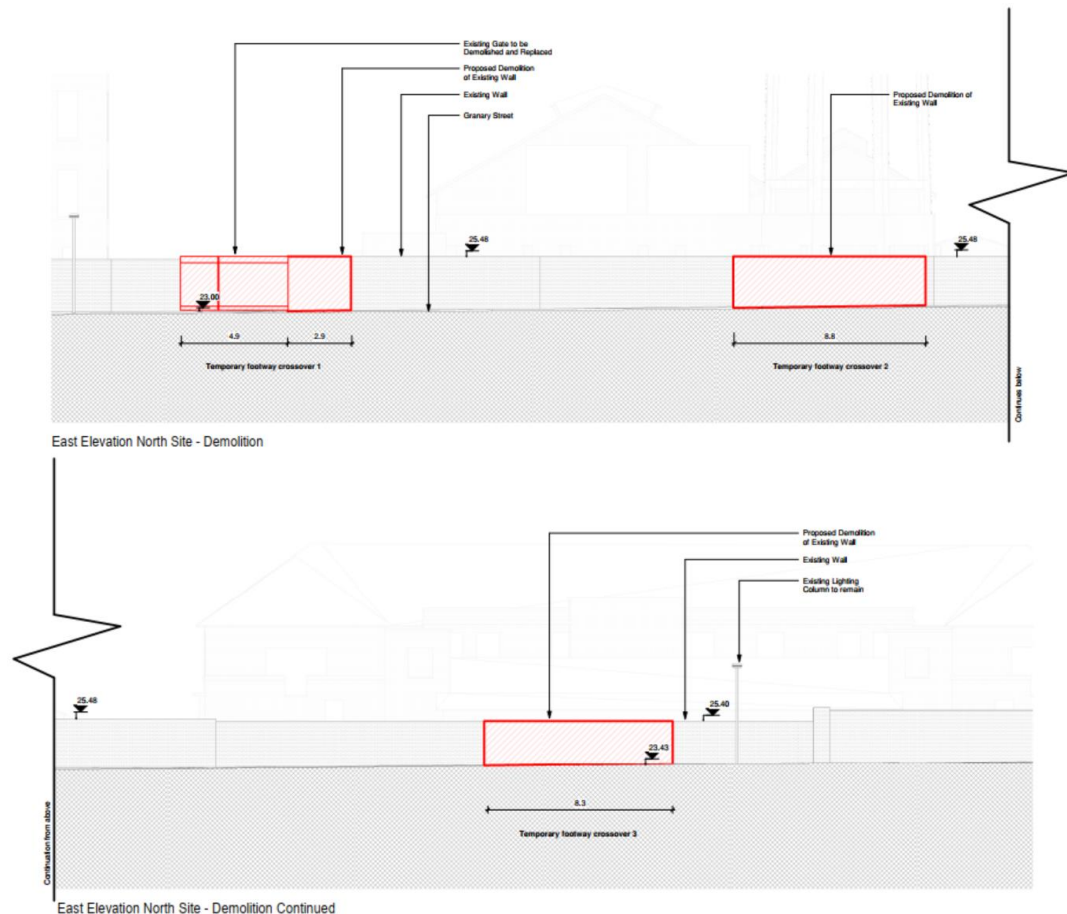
Demolition Elevation showing areas of brickwork to be removed.
